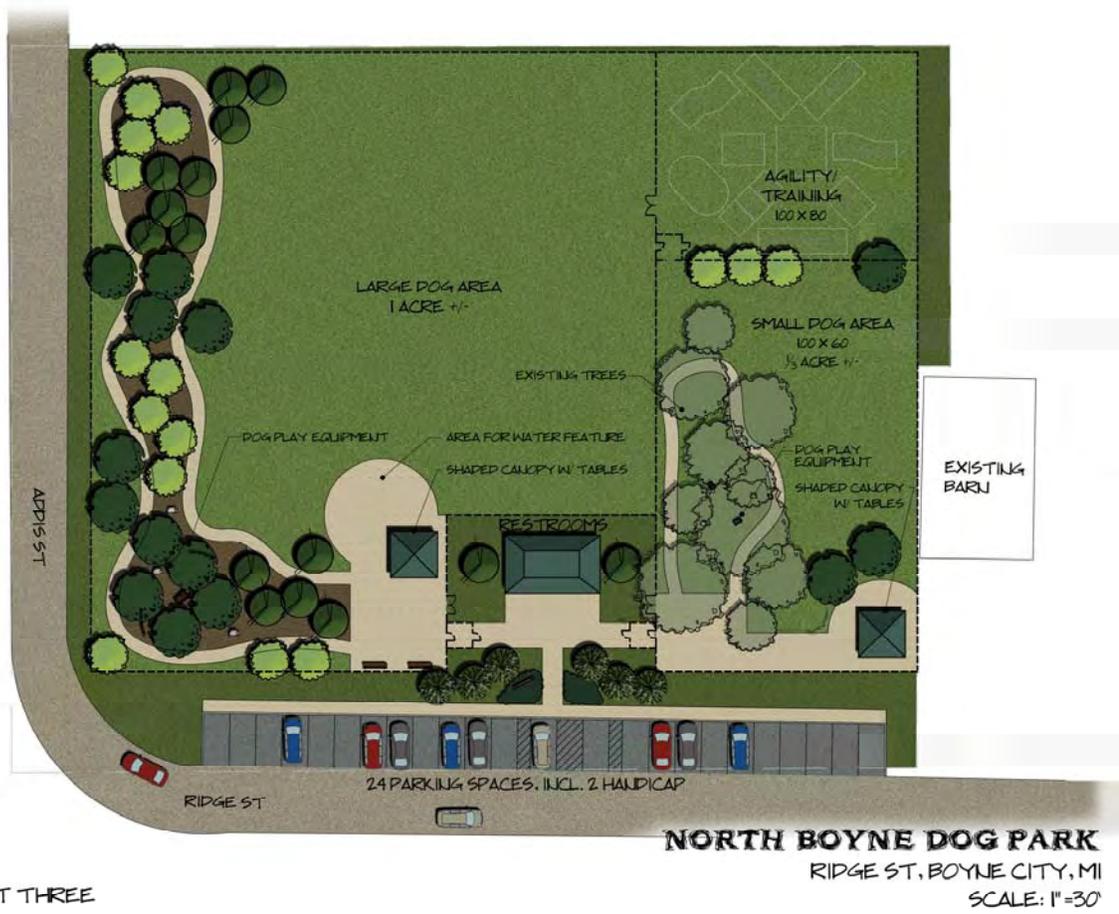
SITE PLAN CONCEPT 1, OPTION B
